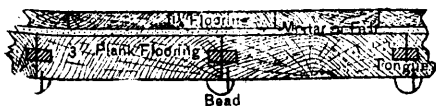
Detail of Floor.—Scale, 1-Inch to the Foot
